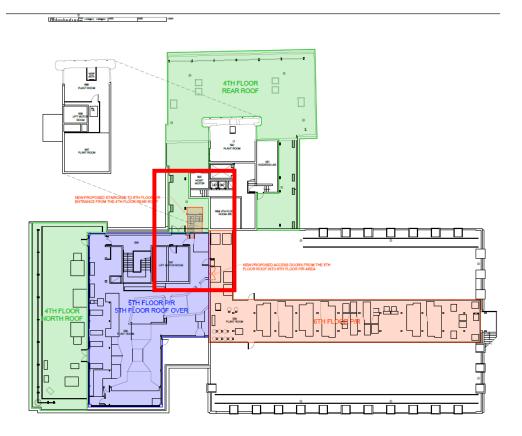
Extract of drawing ref. 067-M01-002 showing the new staircase and door in plan form (staircase location highlighted by red square).
